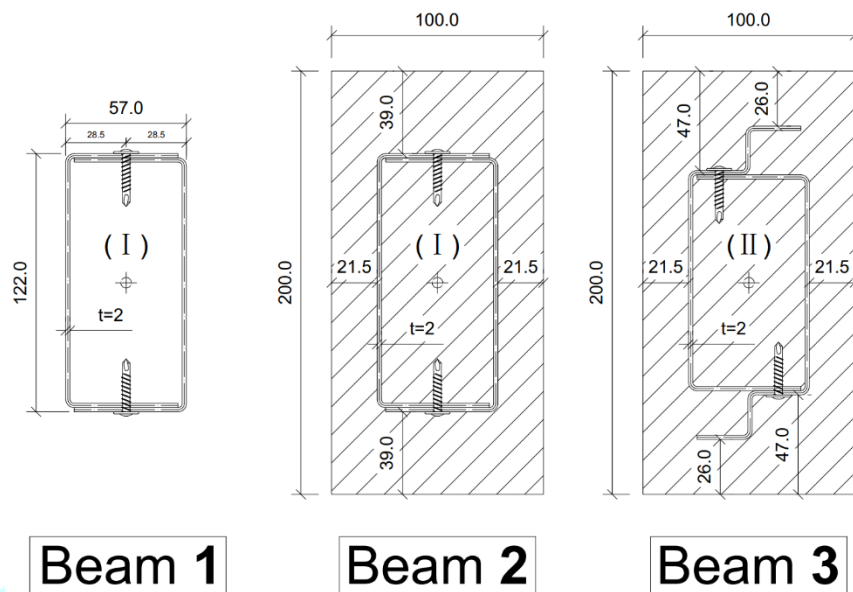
Final cross-sections of Beams 1, 2, and 3 in bare steel & composite conditions.
